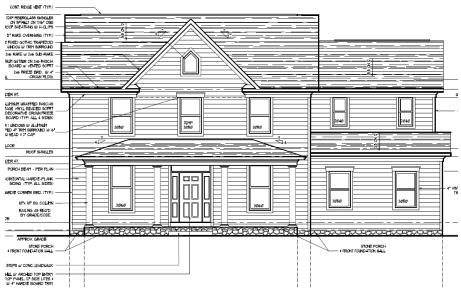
Proposed front elevation. The application proposes to retain the stone cladding on the front elevation and on the porch sides.
